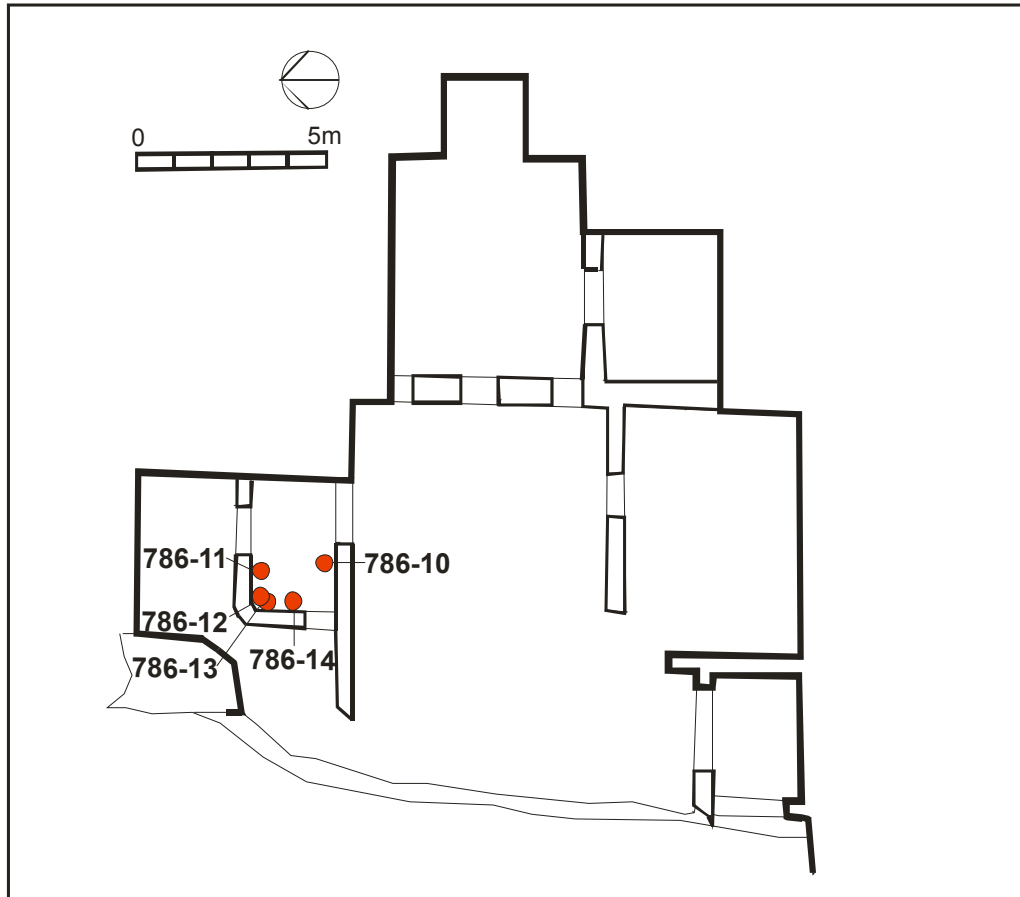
Plan of the house with sample location (plan after Horsfield 1938: Fig. 6).
